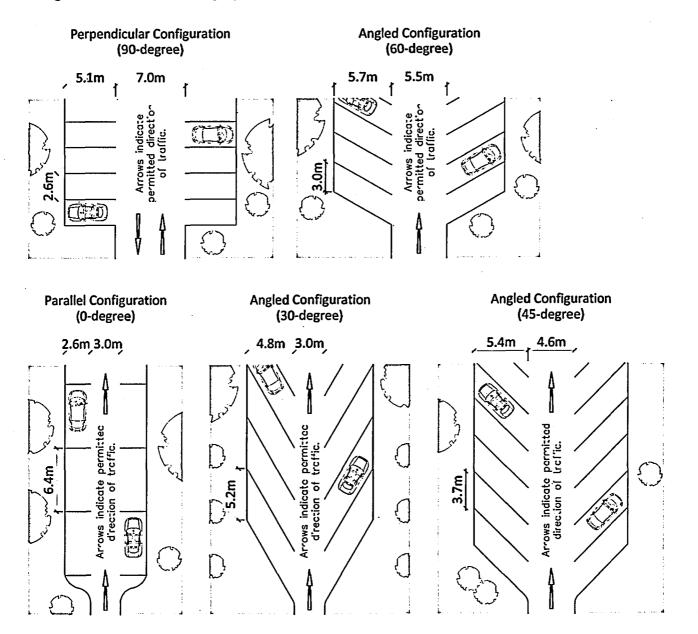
Minimum Parking Space and <u>Drive Aisle</u> Dimensions (all measurements in metres)
